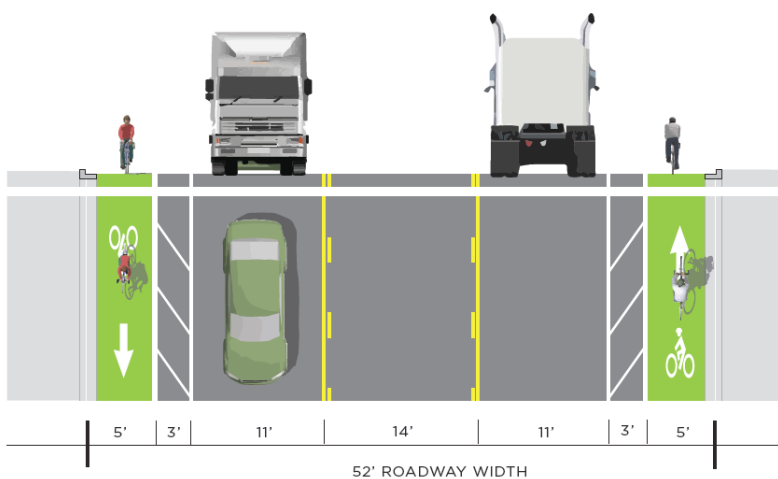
Vernon Avenue between Alameda Street and Santa Fe Avenue
